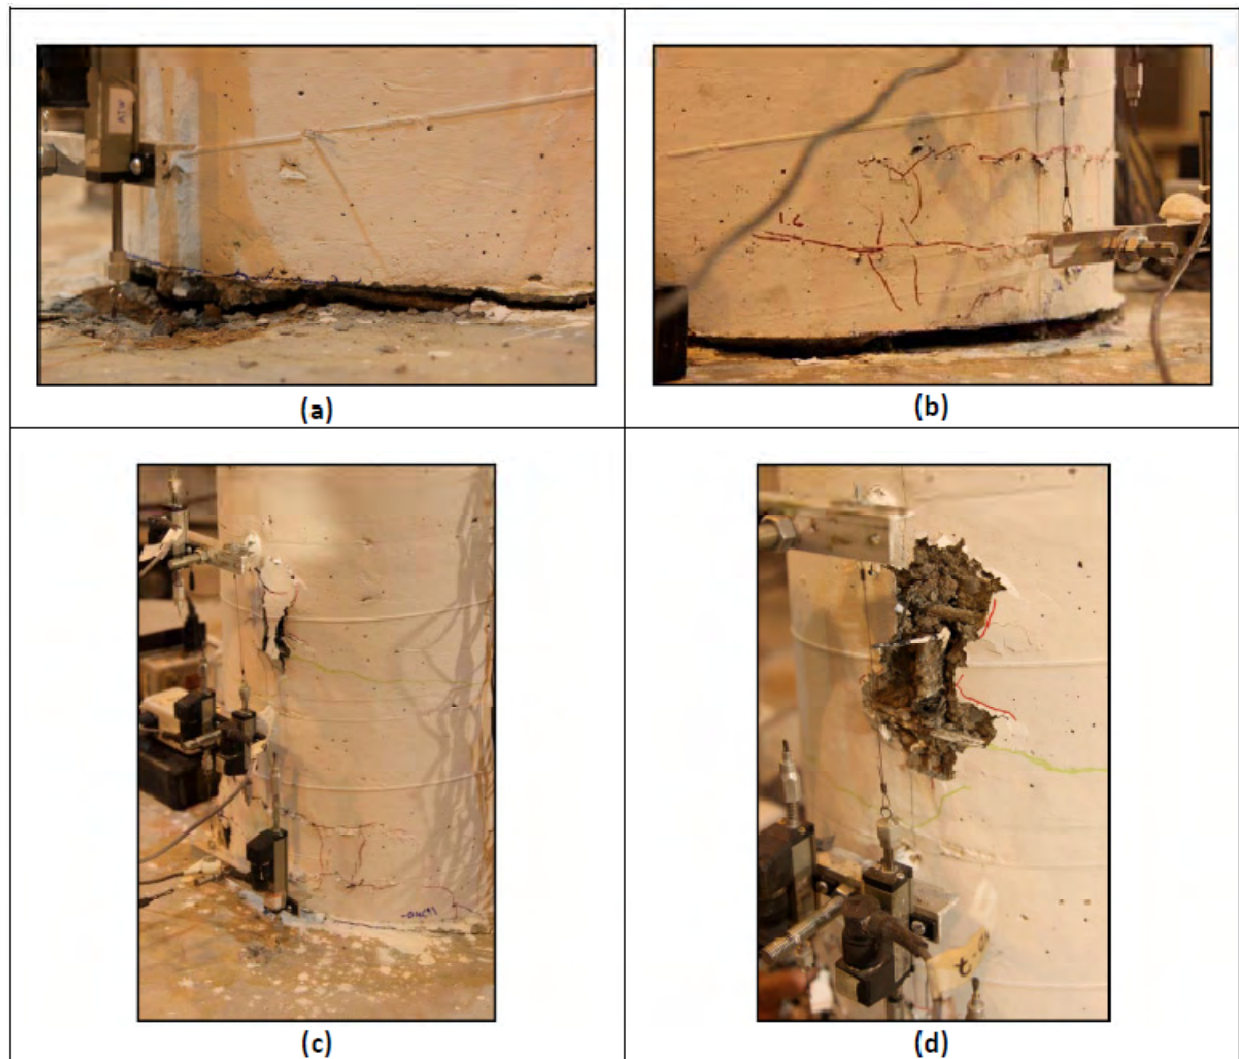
(a) Crack opening at column-foundation interface at $\theta_r = 2.4\%$ on the west face of the column during eastward response; (b) crack opening at column-foundation interface at $\theta_r = 2.4\%$ of the east face of the column during westward response; (c) damage state of the east column face for eastward response at $\theta_r = 3.6\%$ where buckling of C107 bar was first observed; and (d) buckled bar C107 at $\theta_r = 4.8\%$ on the east column face.
